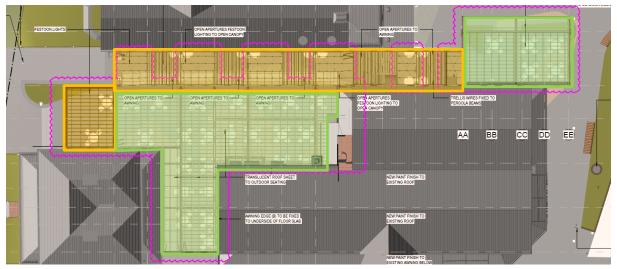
Roof plan illustrating the open areas of the awning (orange) and covered (green).
